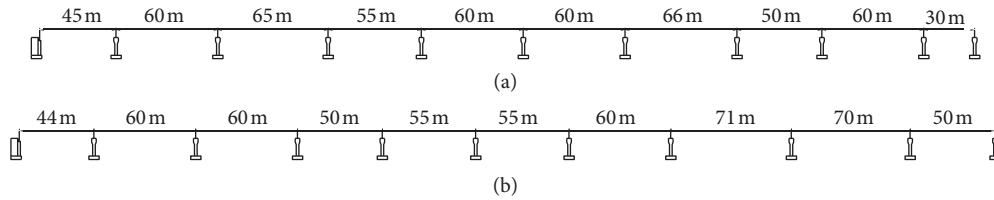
Longitudinal sections with span length of the two bridge design alternatives (G1 and G2).
